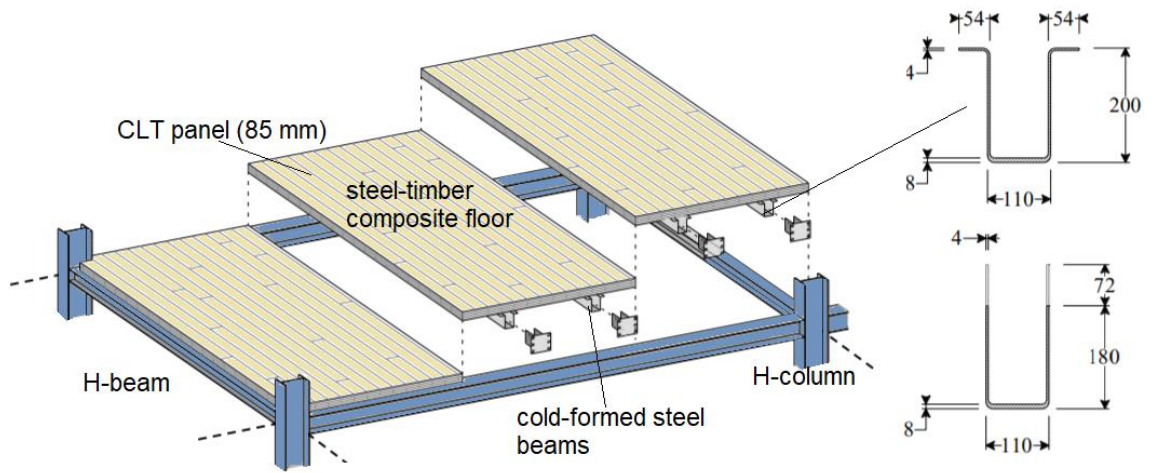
Composite steel-CLT timber floor used with steel frame (Loss et al. 2016)
